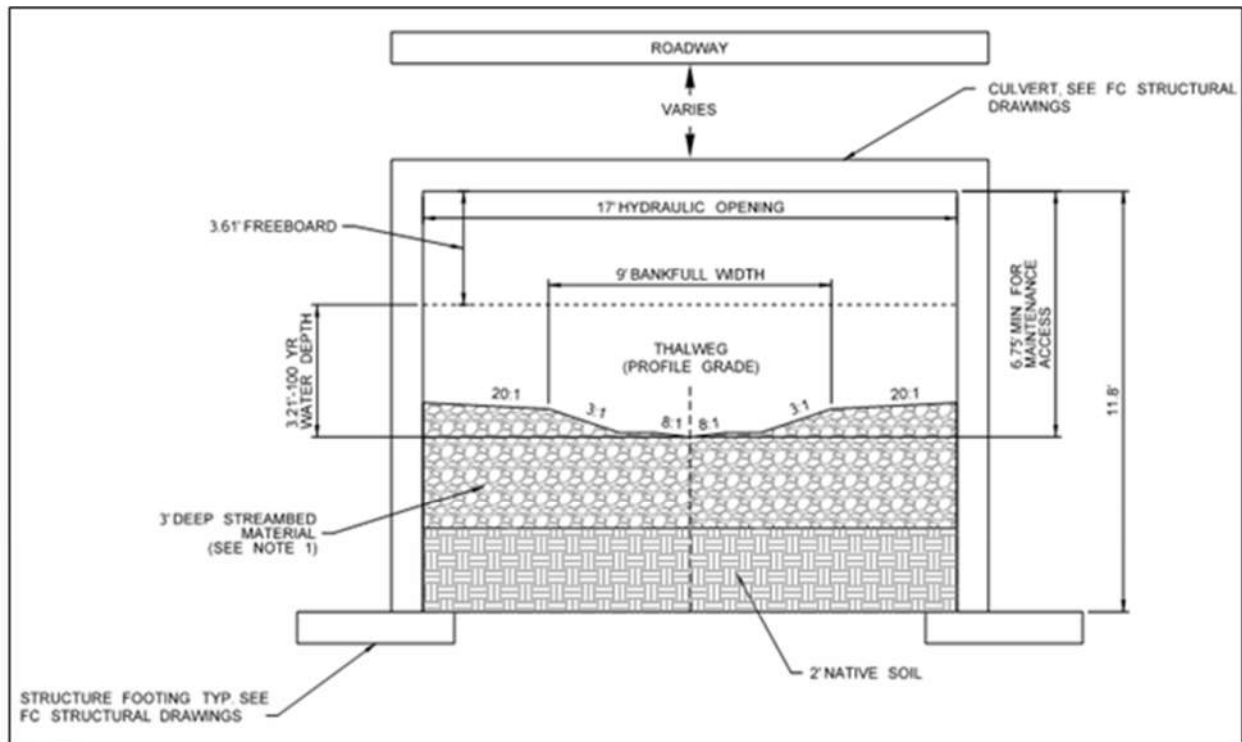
Typical Section Through Proposed Structure Crossing at 114th Place NE
